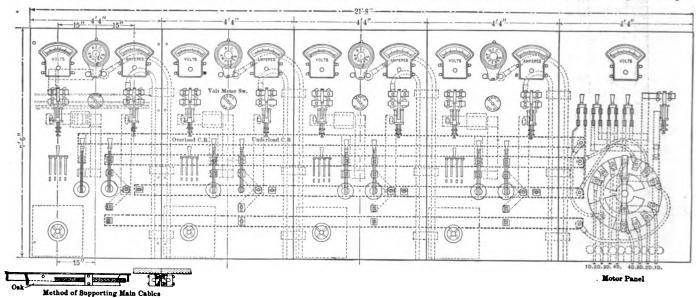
BATTERY SWITCHBOARD, ENGLEWOOD & CHICAGO ELECTRIC STREET RAILWAY CO.
